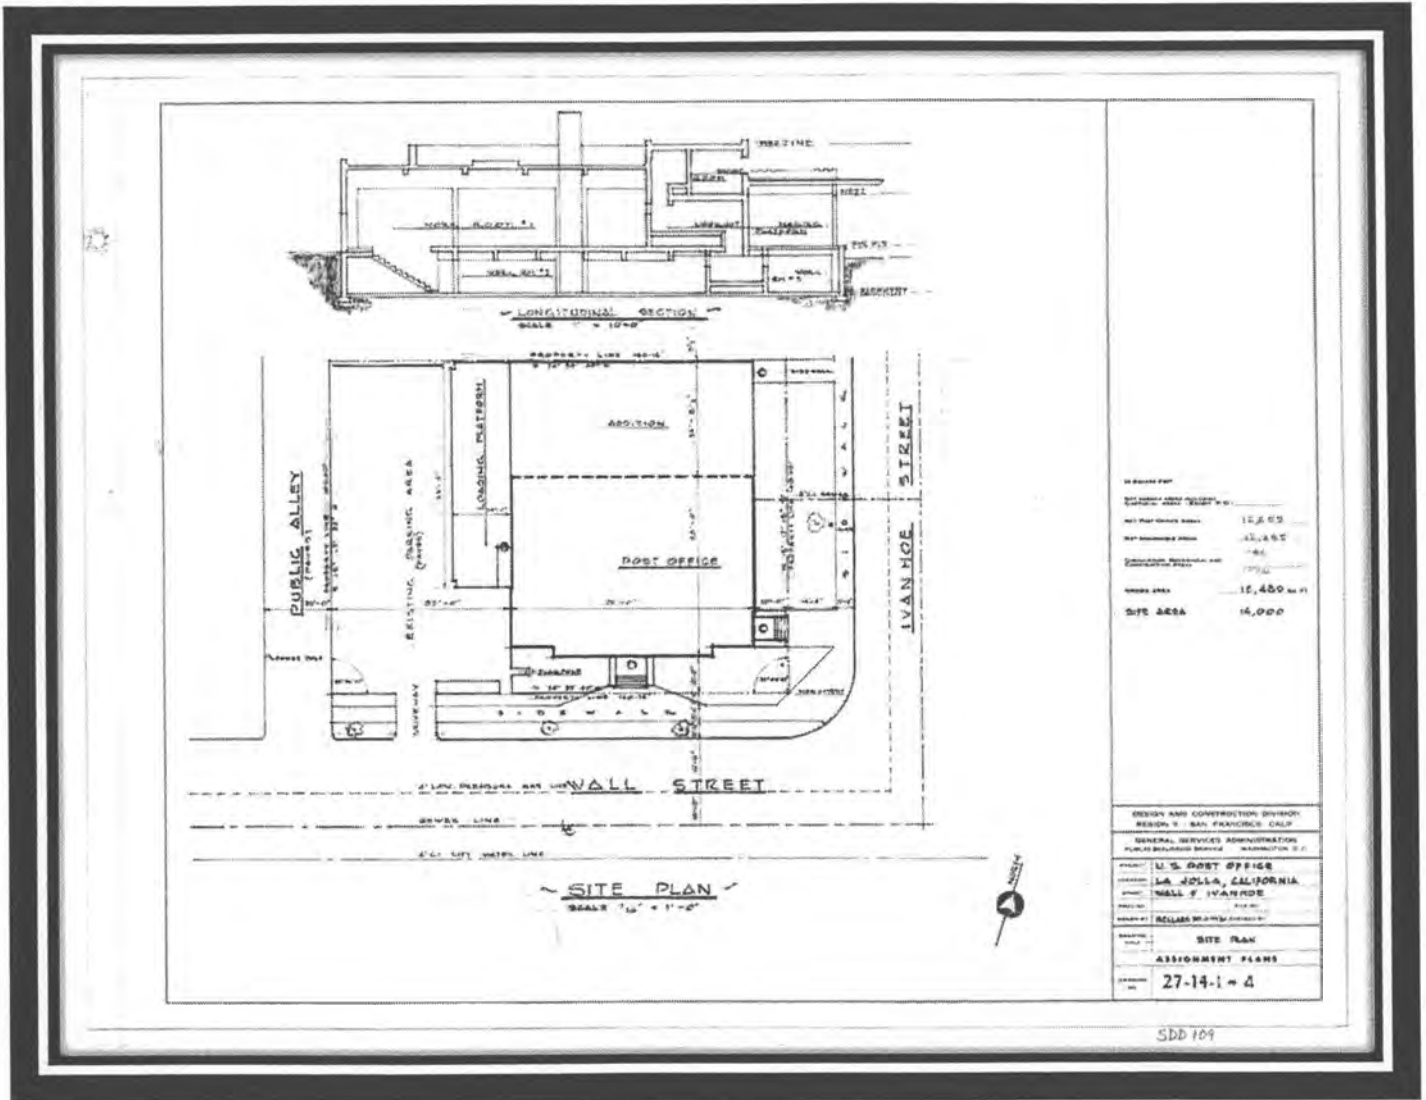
1960 Site Plan and Longitudinal Cross-Section.
